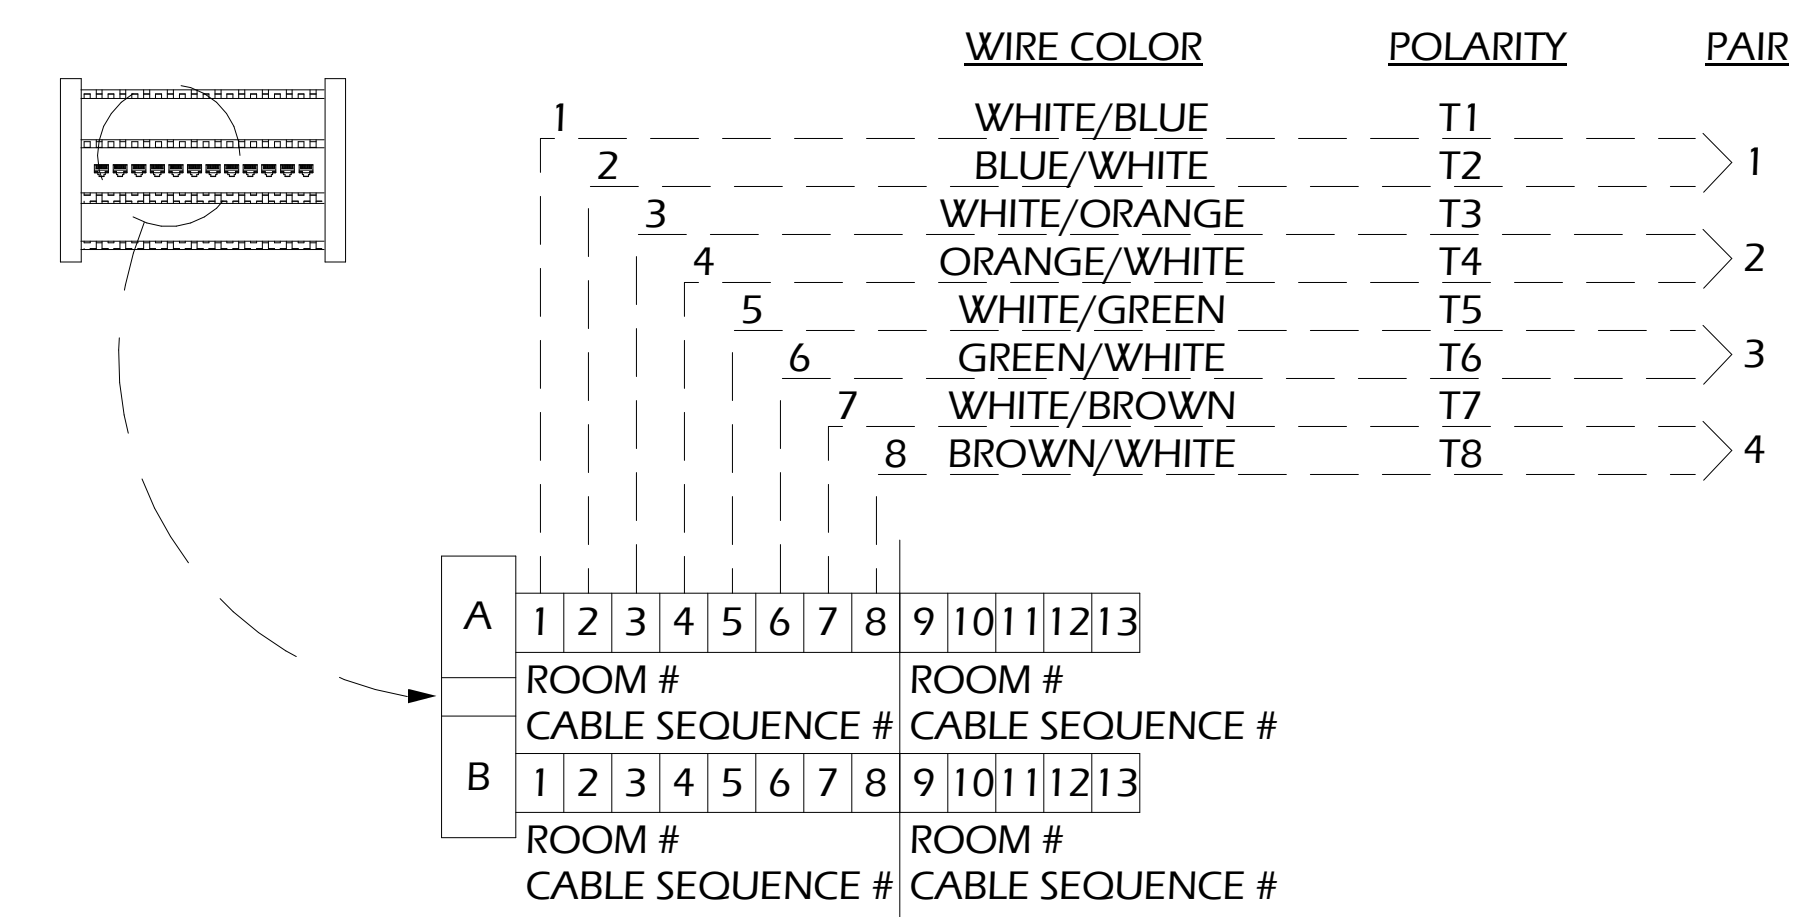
DETAIL NOT TO SCALE 3 RJ45 JACK TERMINATION - 568A
